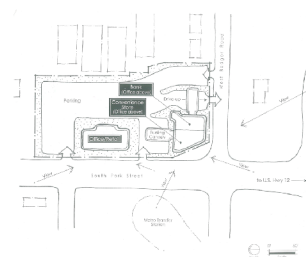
Redevelopment Concept Plan for Site F from Town of Madison Site Redevelopment Strategy and Concept Plan for site just south of Villager Mall.
